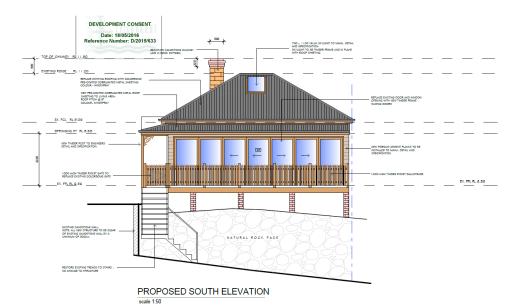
Approved plans for proposed south elevation of 18 Johnston Street. Source: D/2015/633, d'Riva Designs, DA-05A, Proposed South Elevation, Feb 2015.
